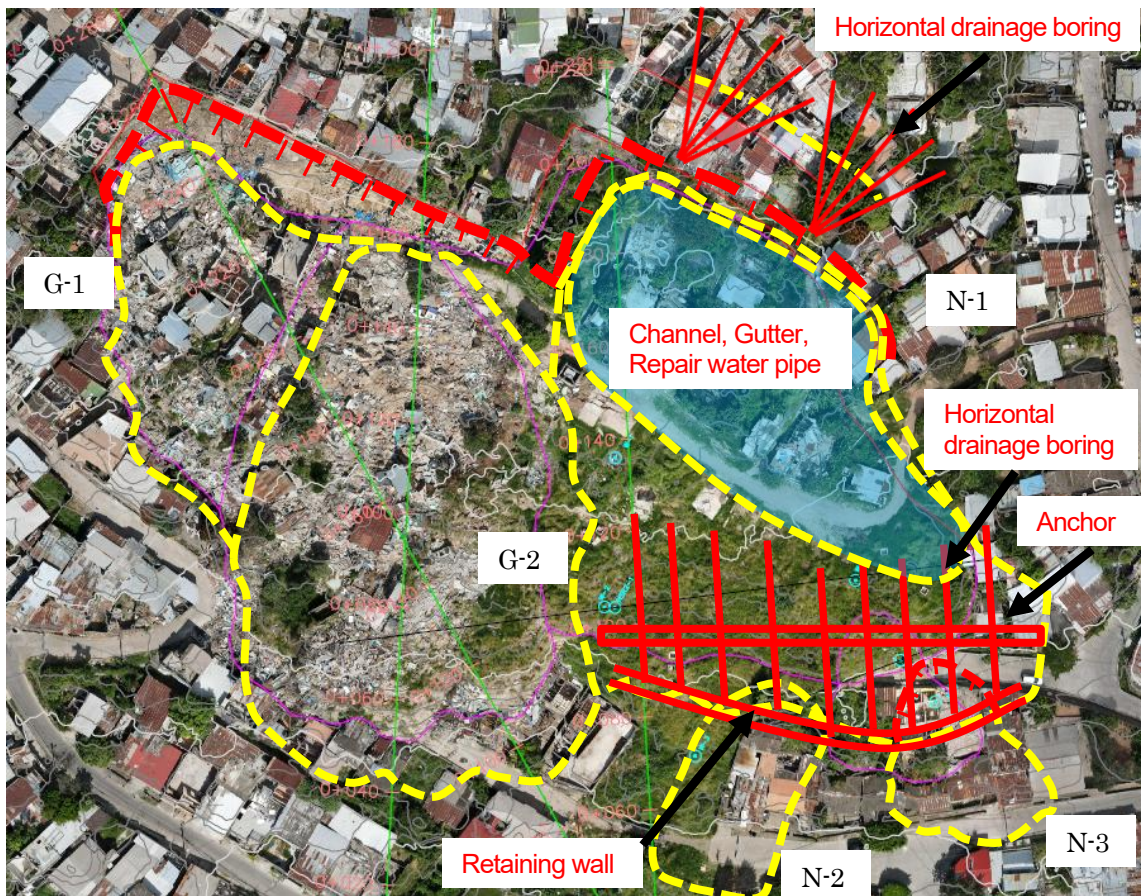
Plan view of proposed permanent measures (Nueva Santa Rosa)
